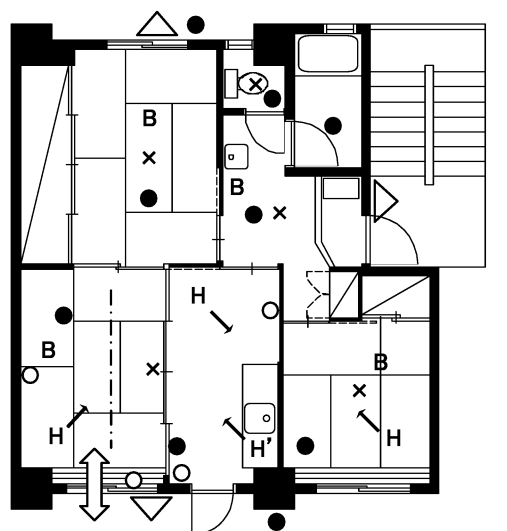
Plan and zoning of the measurement dwelling unit C-1.
